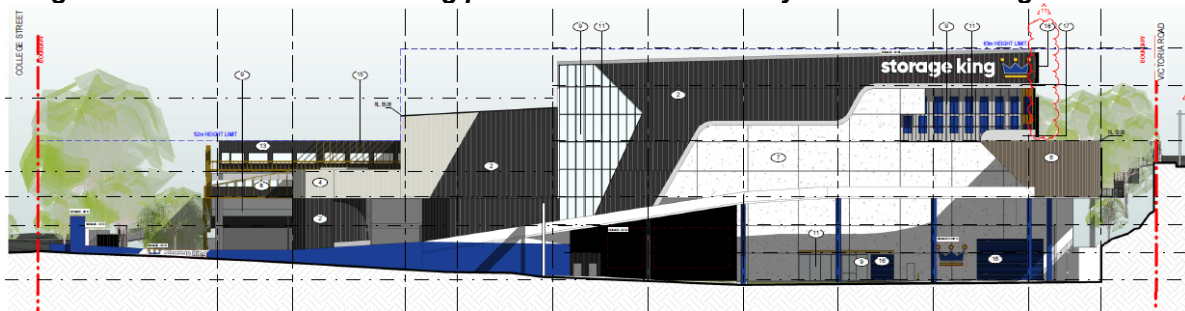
West Elevation along the common boundary with Bunnings Warehouse
